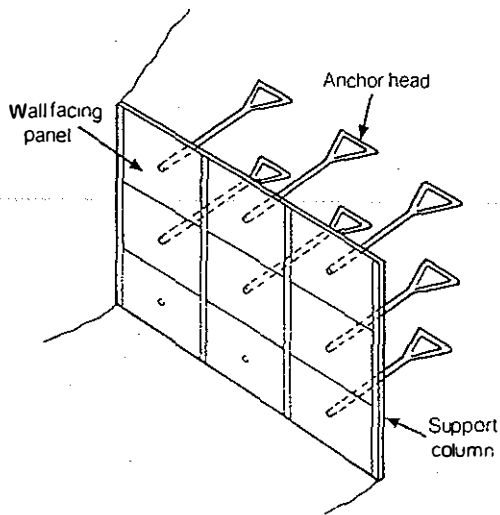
(b) Use of triangular steel anchors (UK, TRRL system)
